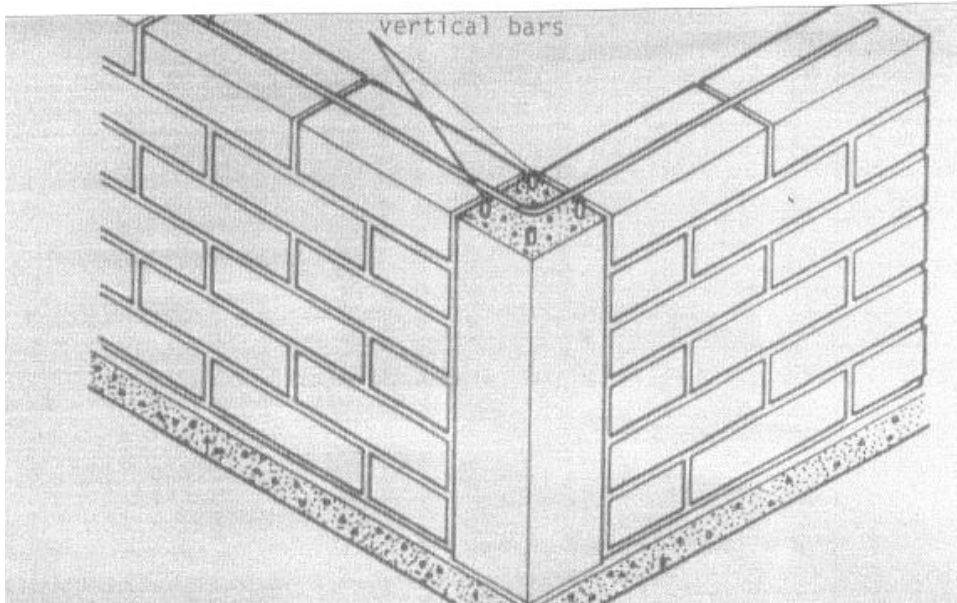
Newly confined reinforced concrete frame and engineered masonry walls.
